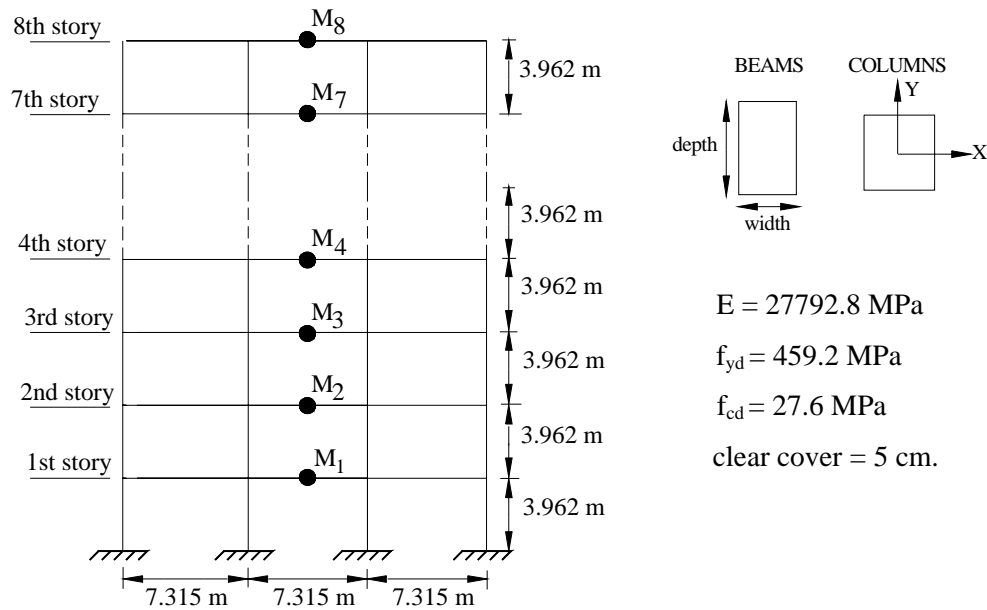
The Configuration of 8-Story Reinforced Concrete Frame
